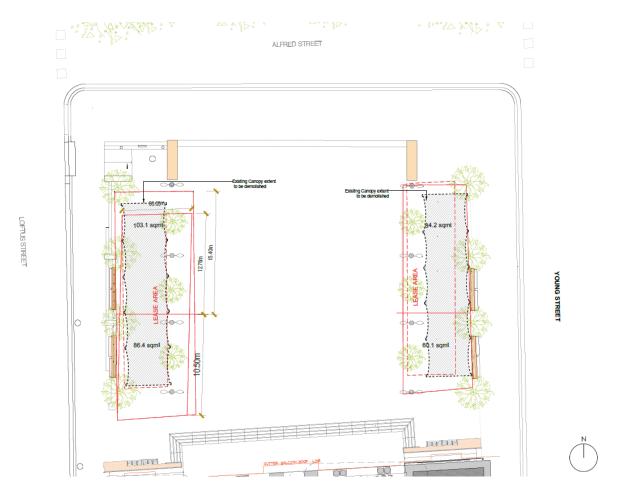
Plan showing the existing canopy structures (dashed black) and proposed new pavilions (dashed red)
